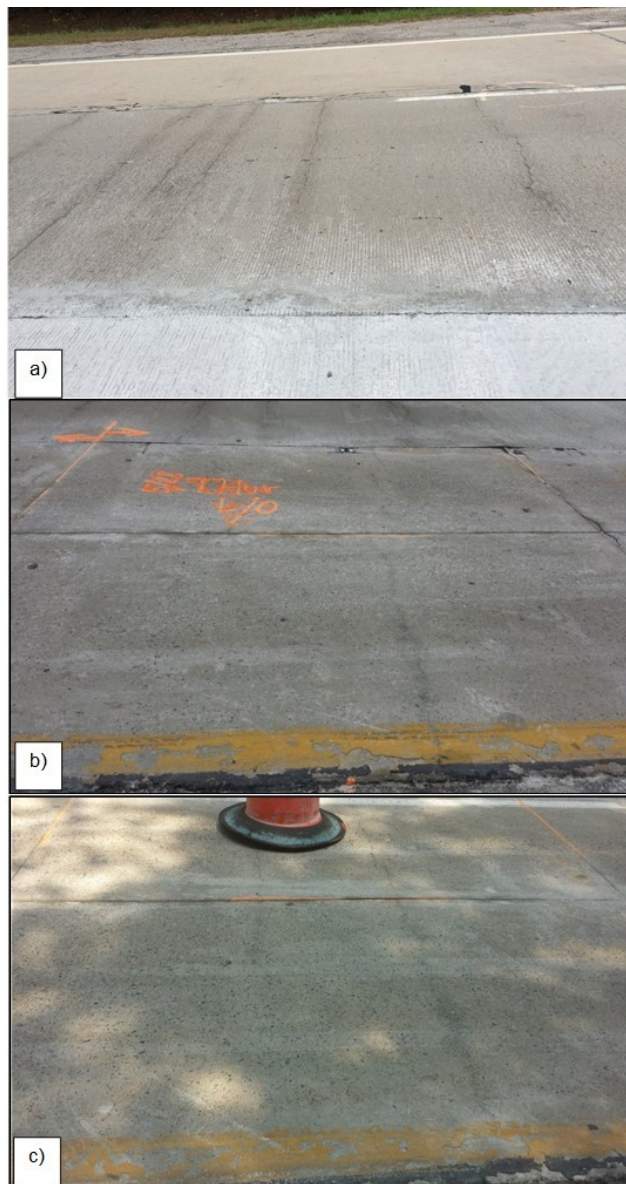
Forty-Year-Old I-85 Pavement That Appears to Be in Good Condition: a) patch a few years old; b) section marked for removal; c) section marked for removal
